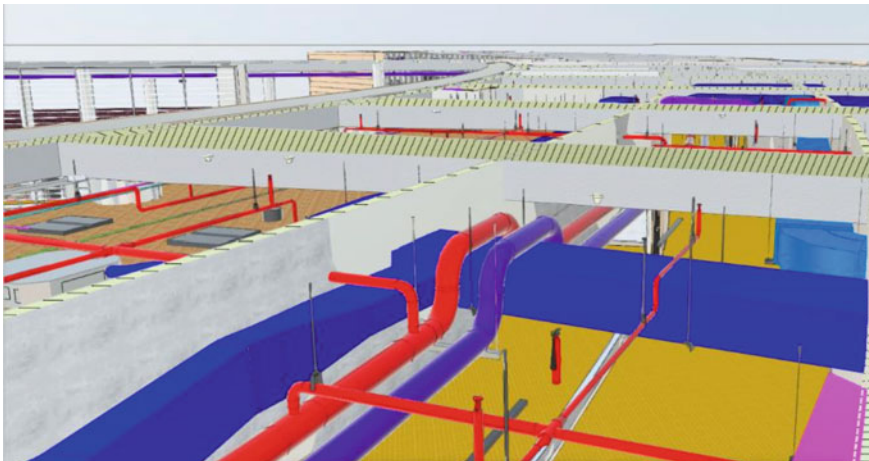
FPS pipe line rerouted above the HVAC duct after clash detection
